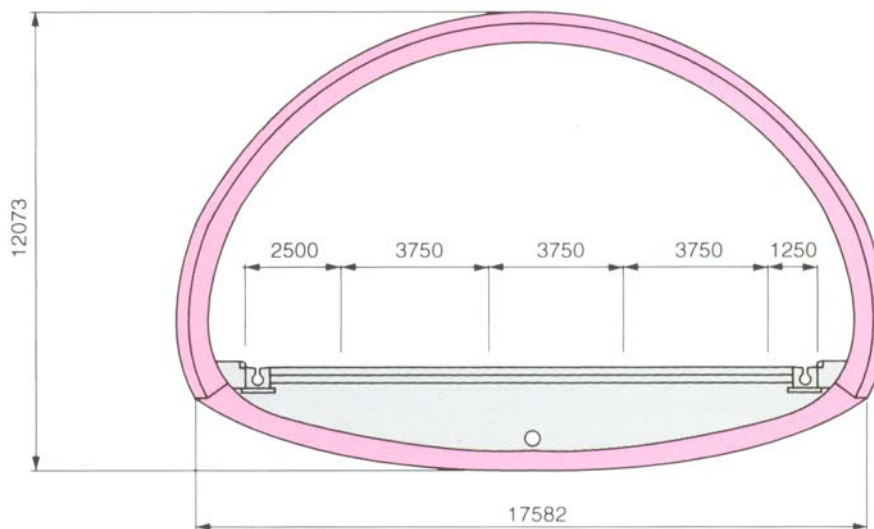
The Standard type of cross section used in Shimizu tunnel No.3. (From Japan Tunnelling Association, 1998).
